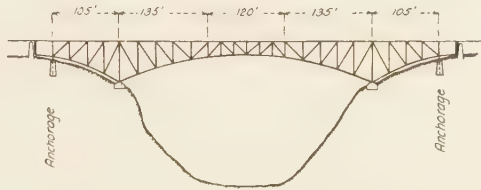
Arroya Del Chico Bridge, Mexico.
